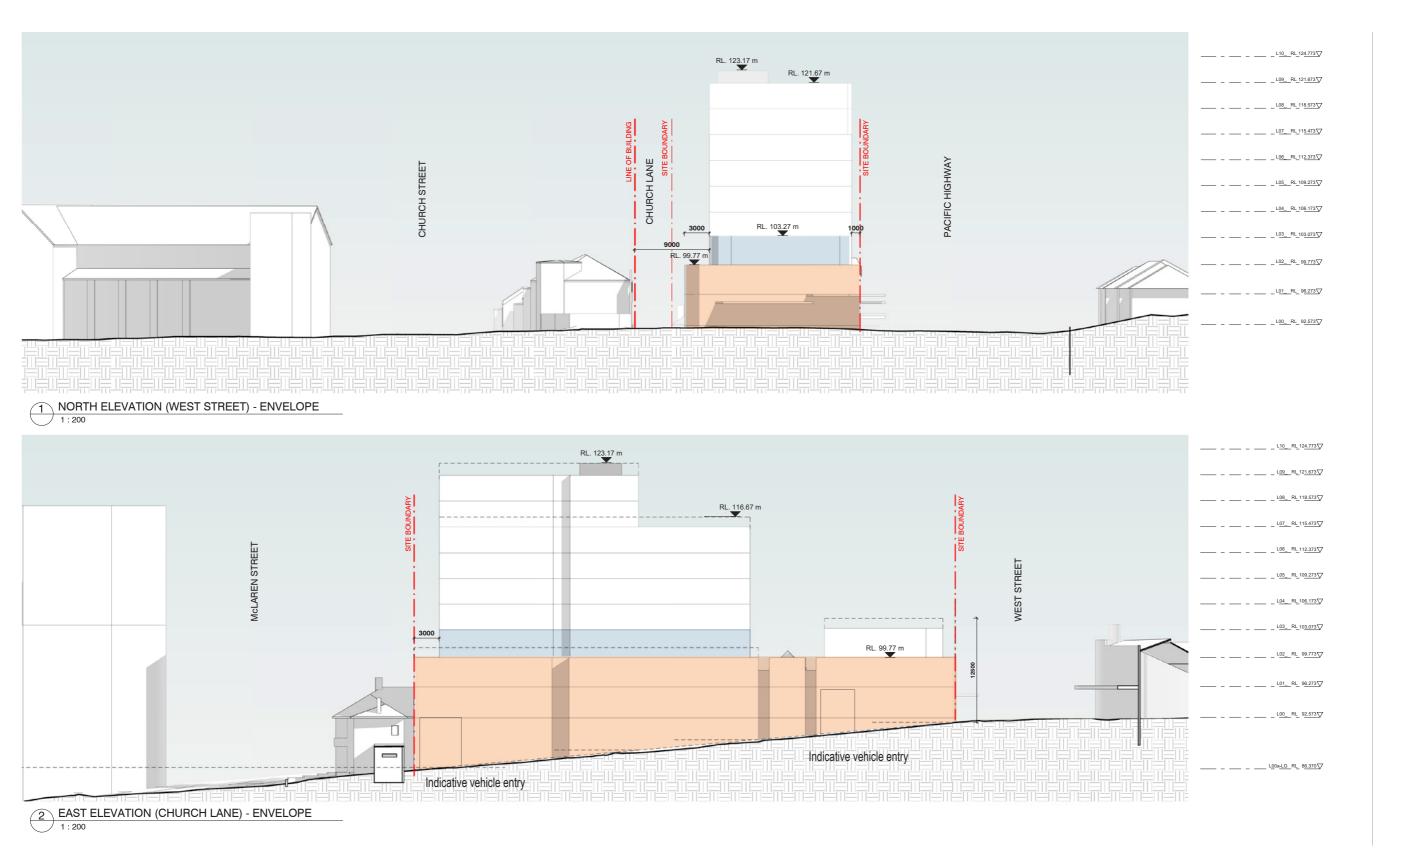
Indicative elevations (adopted from PTW Building Envelope Study and Reference Design).
